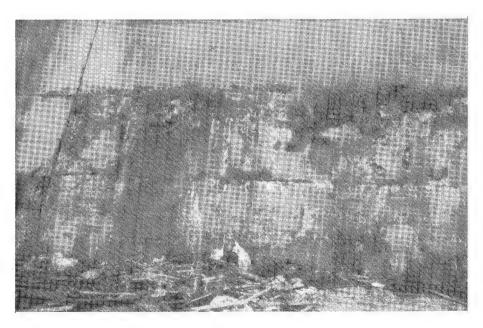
Typical concrete deterioration, Joliet Channel Wall
